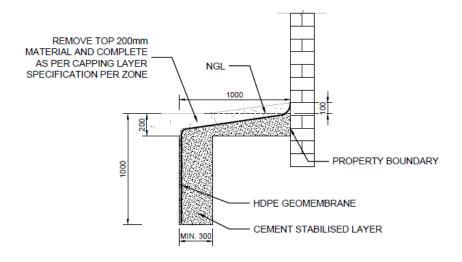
Typical detail of perimeter rodent barrier
